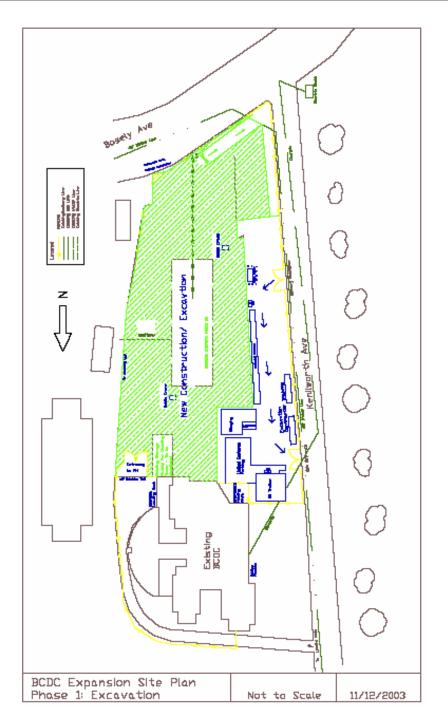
Phase 1 Site Plan (larger PDF file available on webpage)
